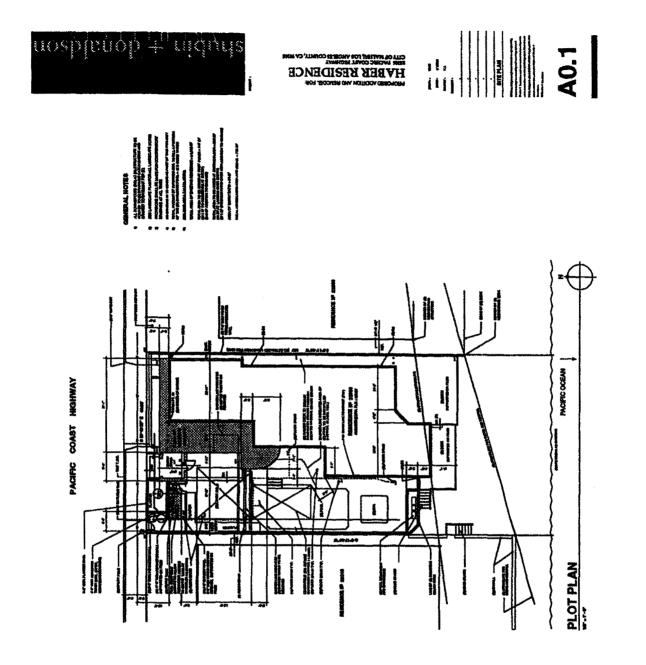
APPLICATION2NO. Site Plan
